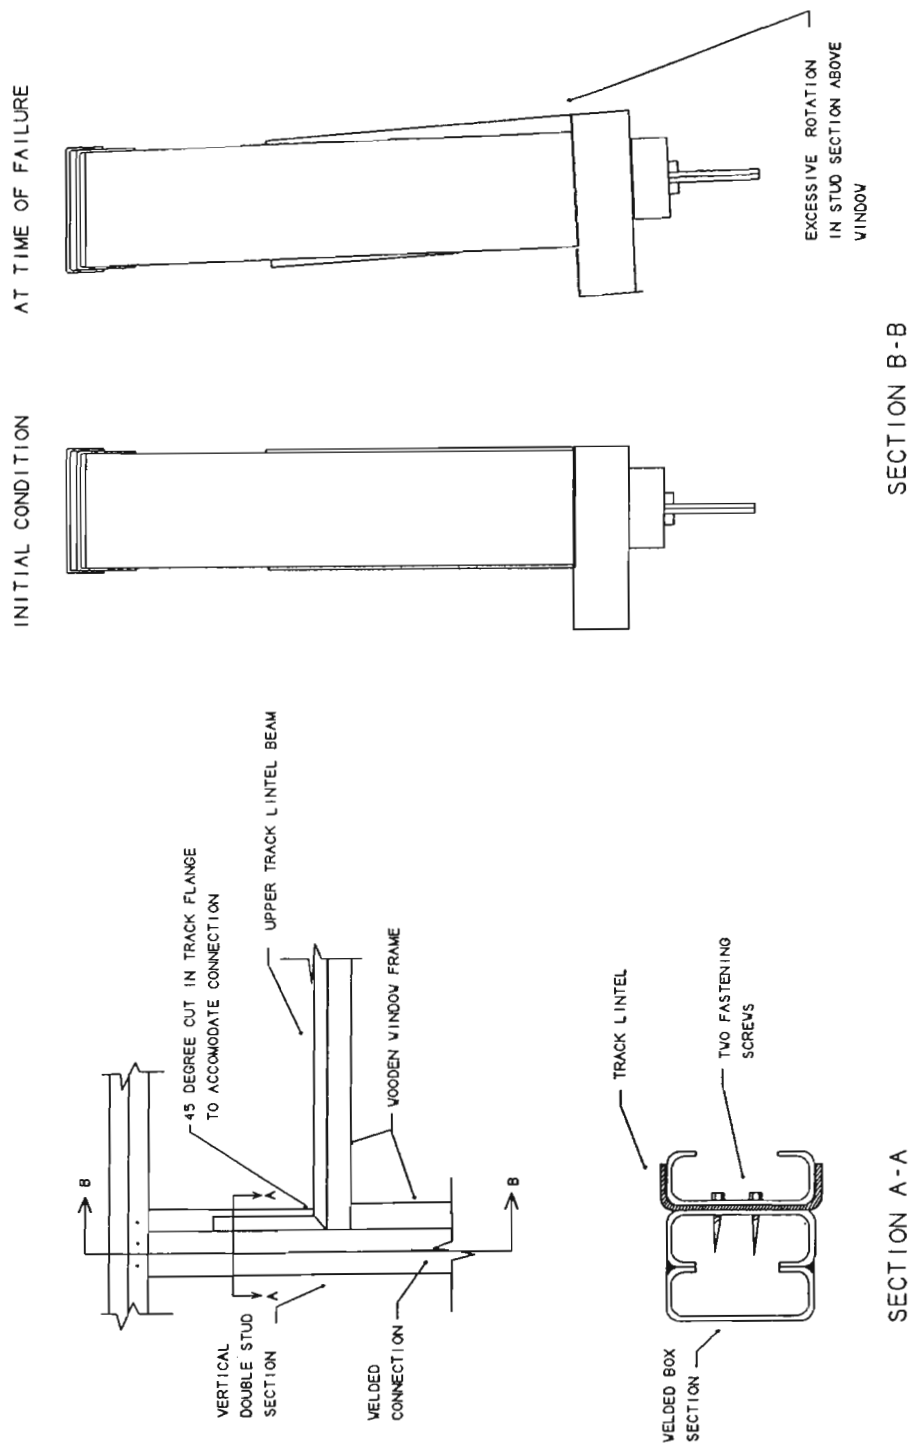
FAILURE OF BACKUP PANEL AT WINDOW OPENING
